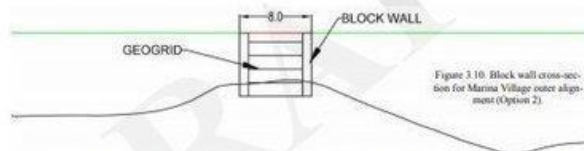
Block wall cross-section for Marina Village outer alignment (Option 2).
